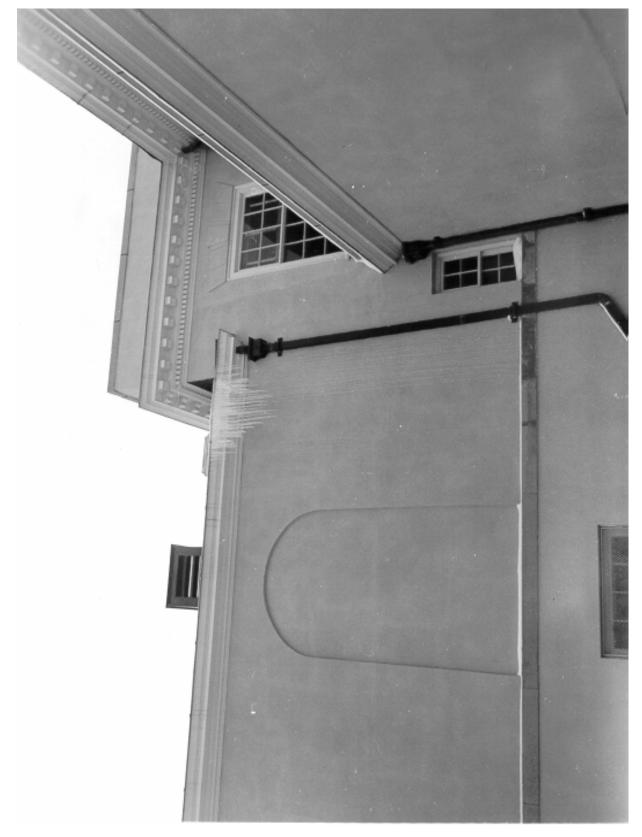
Morristown Museum Building: junction of east wing, main/front structure, main/rear structure, and east extension (1967).
